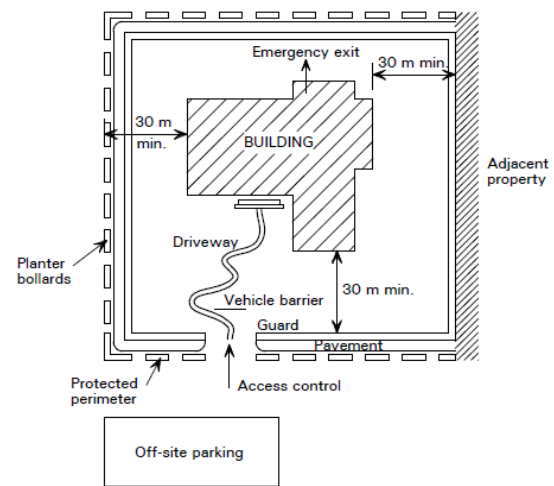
External Layout Planning (Yandzio and Gough, 1999) [2]
